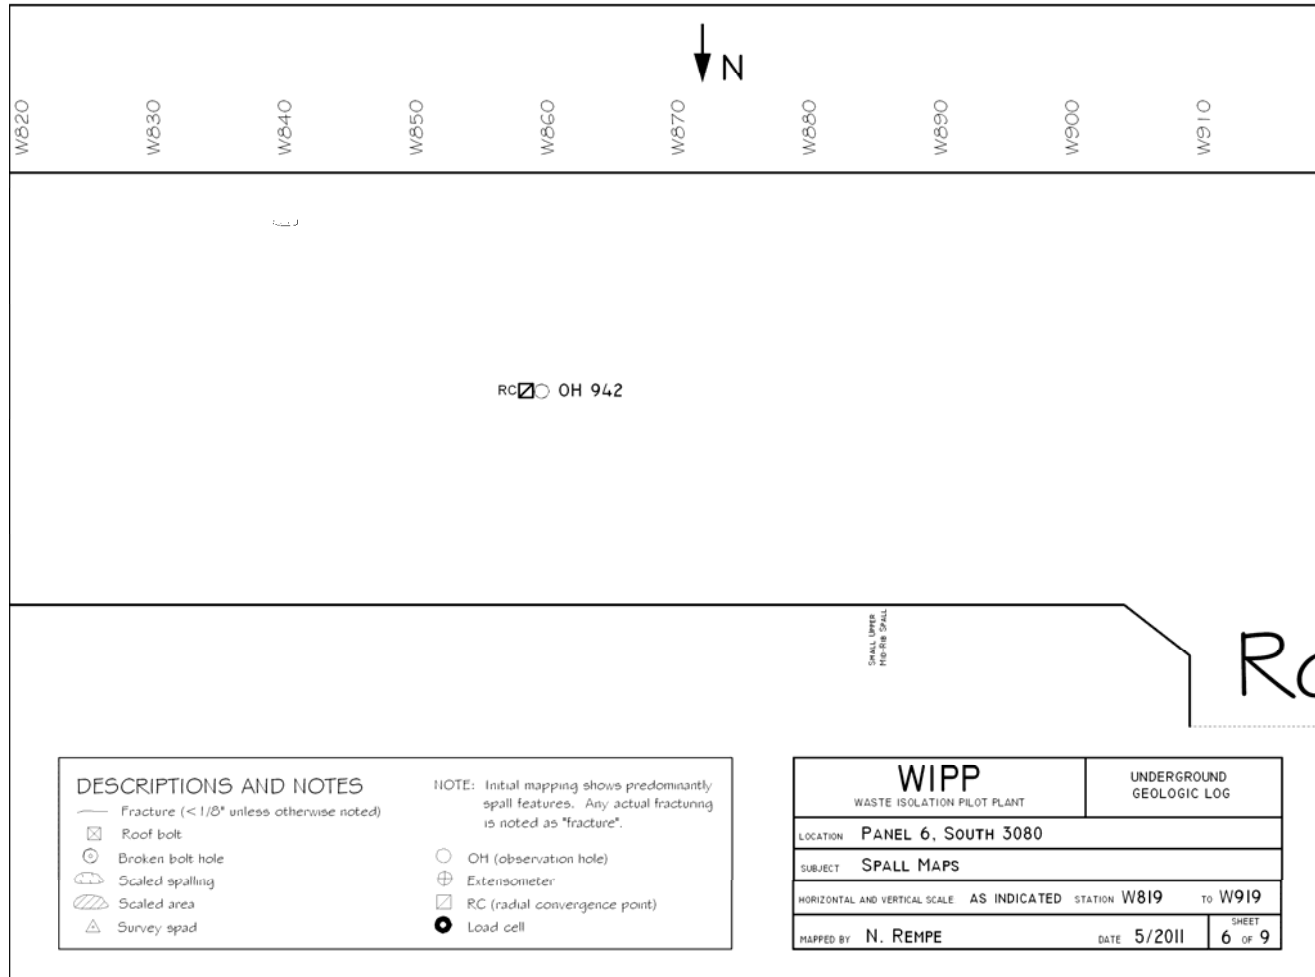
Panel 6 S3080, W390-W1210 Roof Fractures (Sheet 6 of 9)
